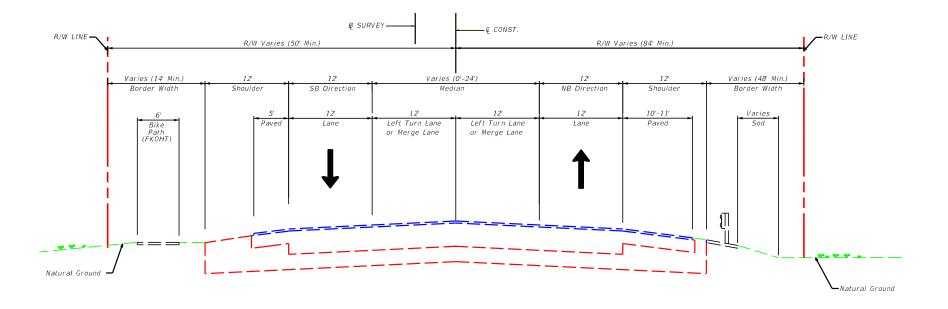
Existing Typical Section from W of Venetian Blvd. to E of Venetian Blvd
